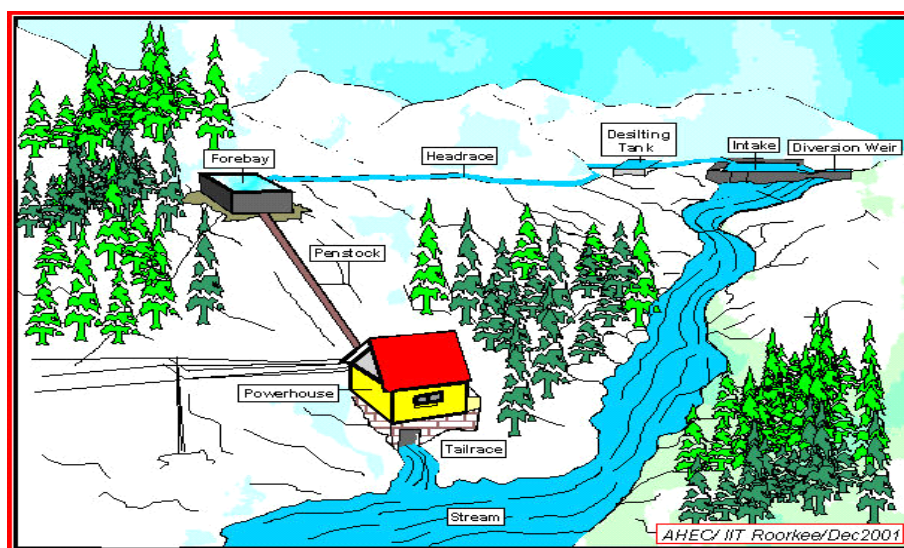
Typical Layout of Mini Hydro Power Project
